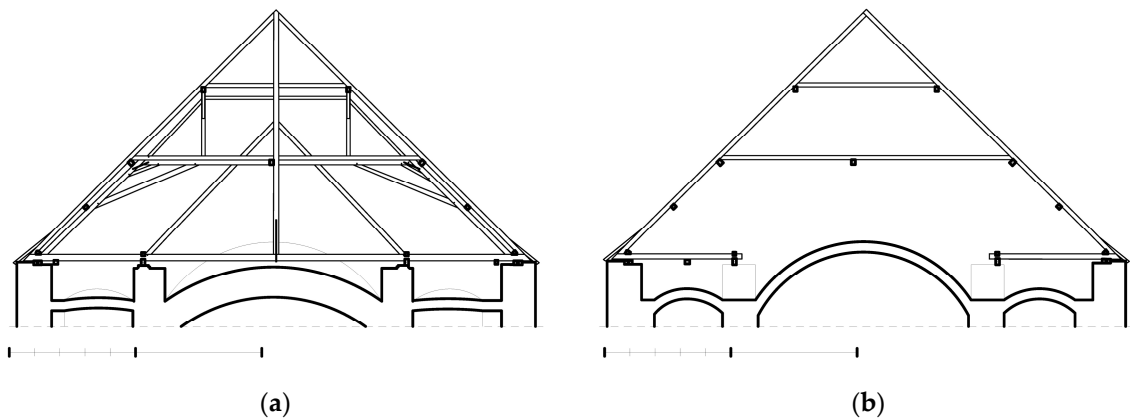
Aiud church roof trusses: (a) main truss; (b) secondary truss.
